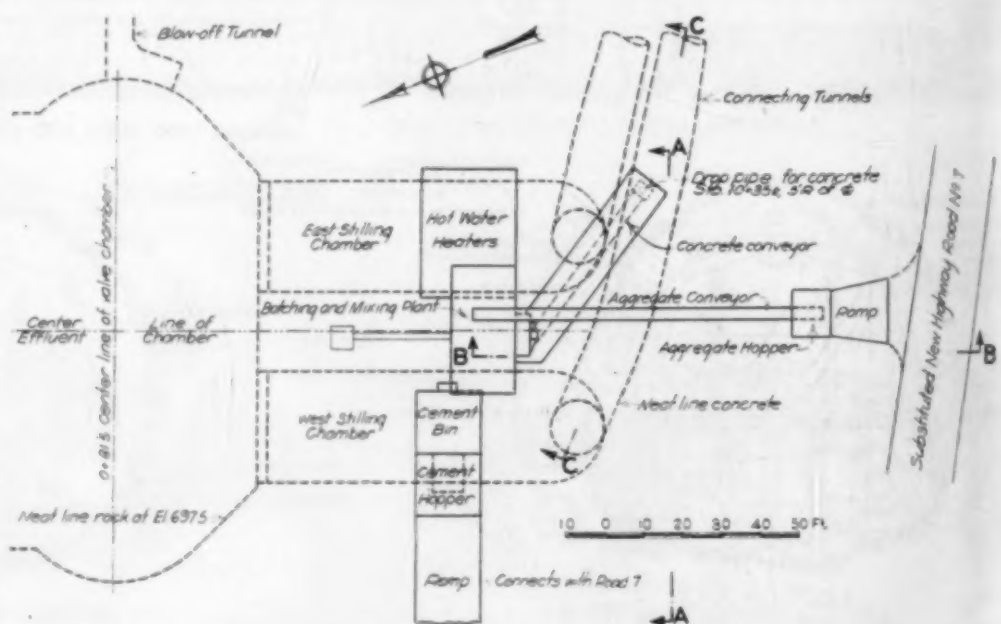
PLAN OF CONCRETING PLANT AT STILLING CHAMBERS (SECTIONS SHOWN IN FIG. 2)
